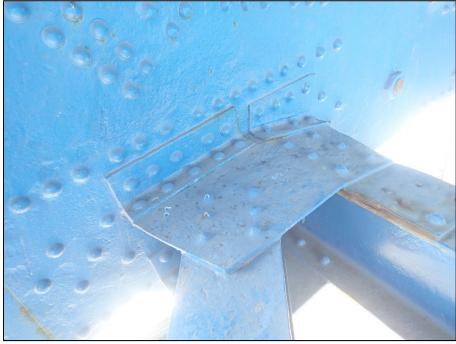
Unit II, Span 1 South truss at L7; Up to 100% section loss to lower lateral bracing gusset plates
